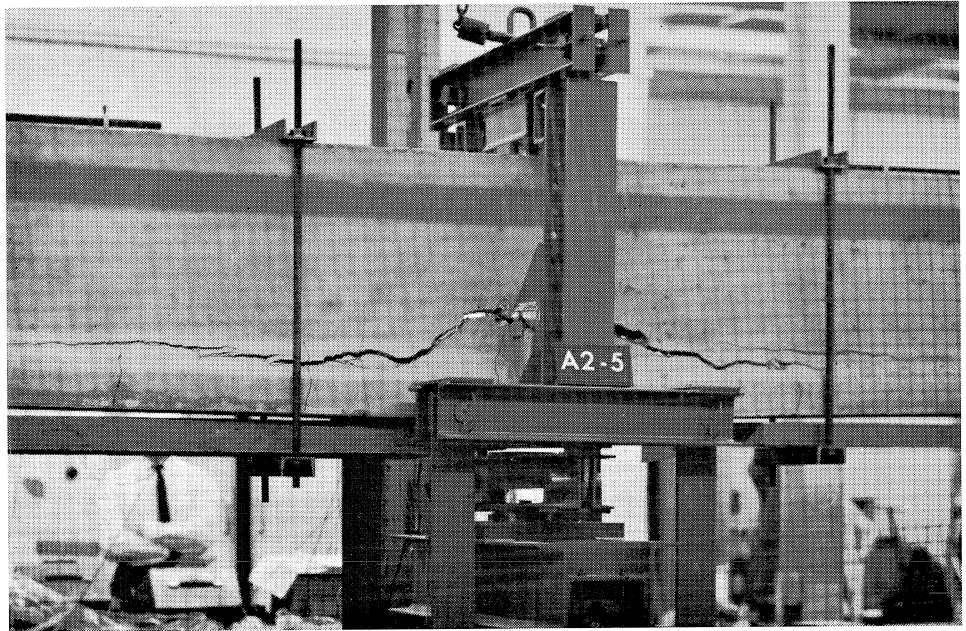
Beam loaded through corbels and containing no suspension reinforcement, but provided with normal stirrup reinforcement. The photograph shows the condition just after the cracking moment was reached.
